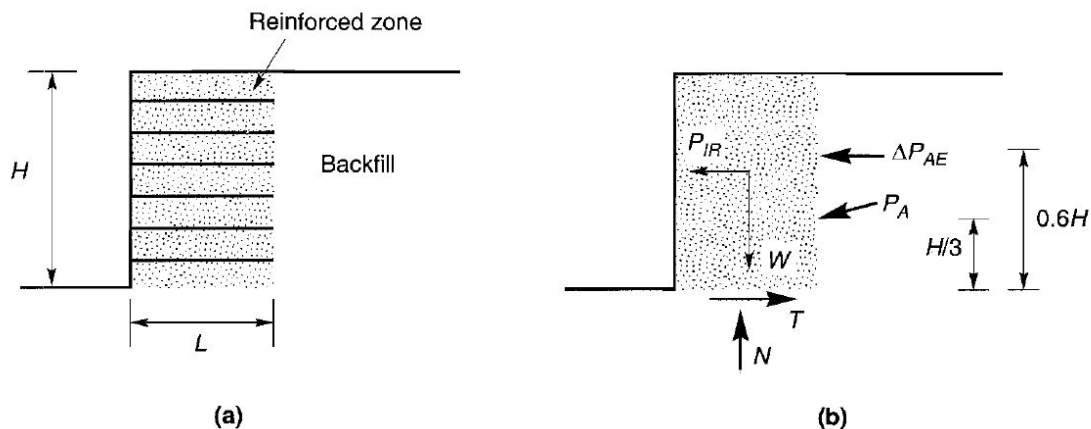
(a) Geometry and notation for reinforced soil walls, (b) Static and pseudostatic forces acting on reinforced zone (Kramer (1996))
